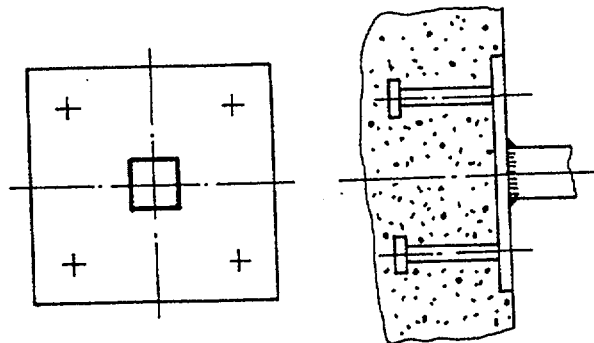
Weld Connections to Steel Members with Studs Embedded into the Concrete Structure
